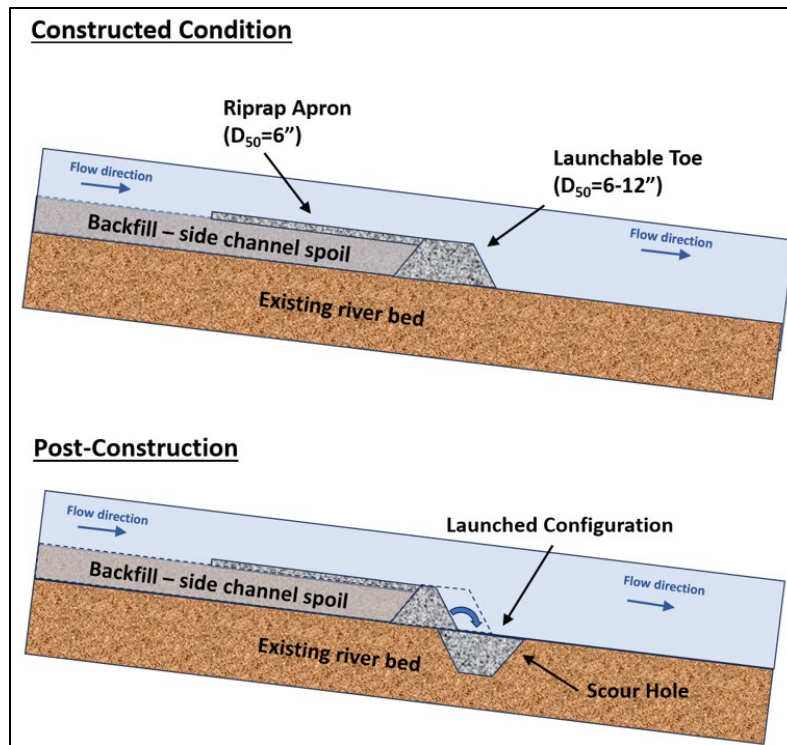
Schematic of a Typical Trenched Bed Control Feature with Upstream Rock Sill. (Schematic [not to scale] shows both the constructed condition and the post-construction condition including the launch of the stone toe.)
